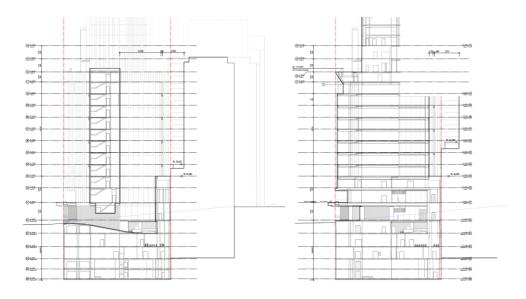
| Proposed podium sections (Source: Woods Bagot)
